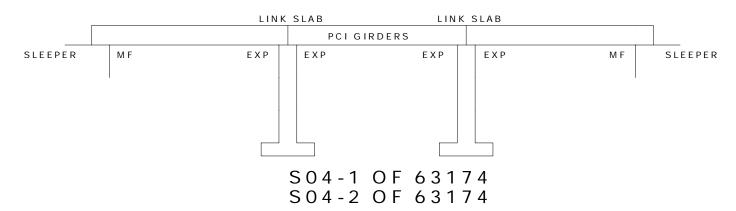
Plan and elevation of S04-1, 2 of 63174
